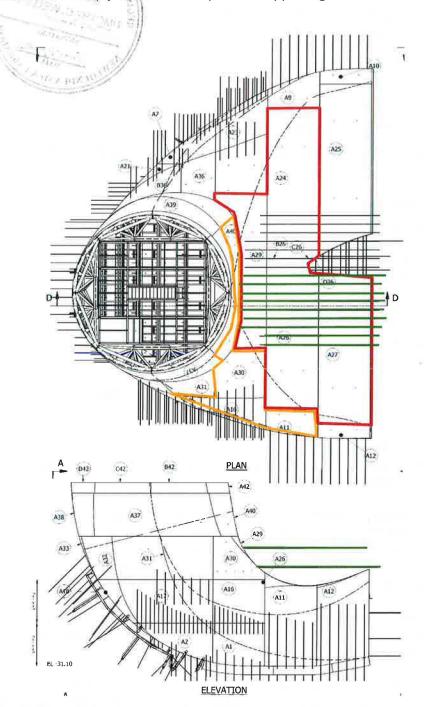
Major CEI formwork elements damaged in the collapse.
